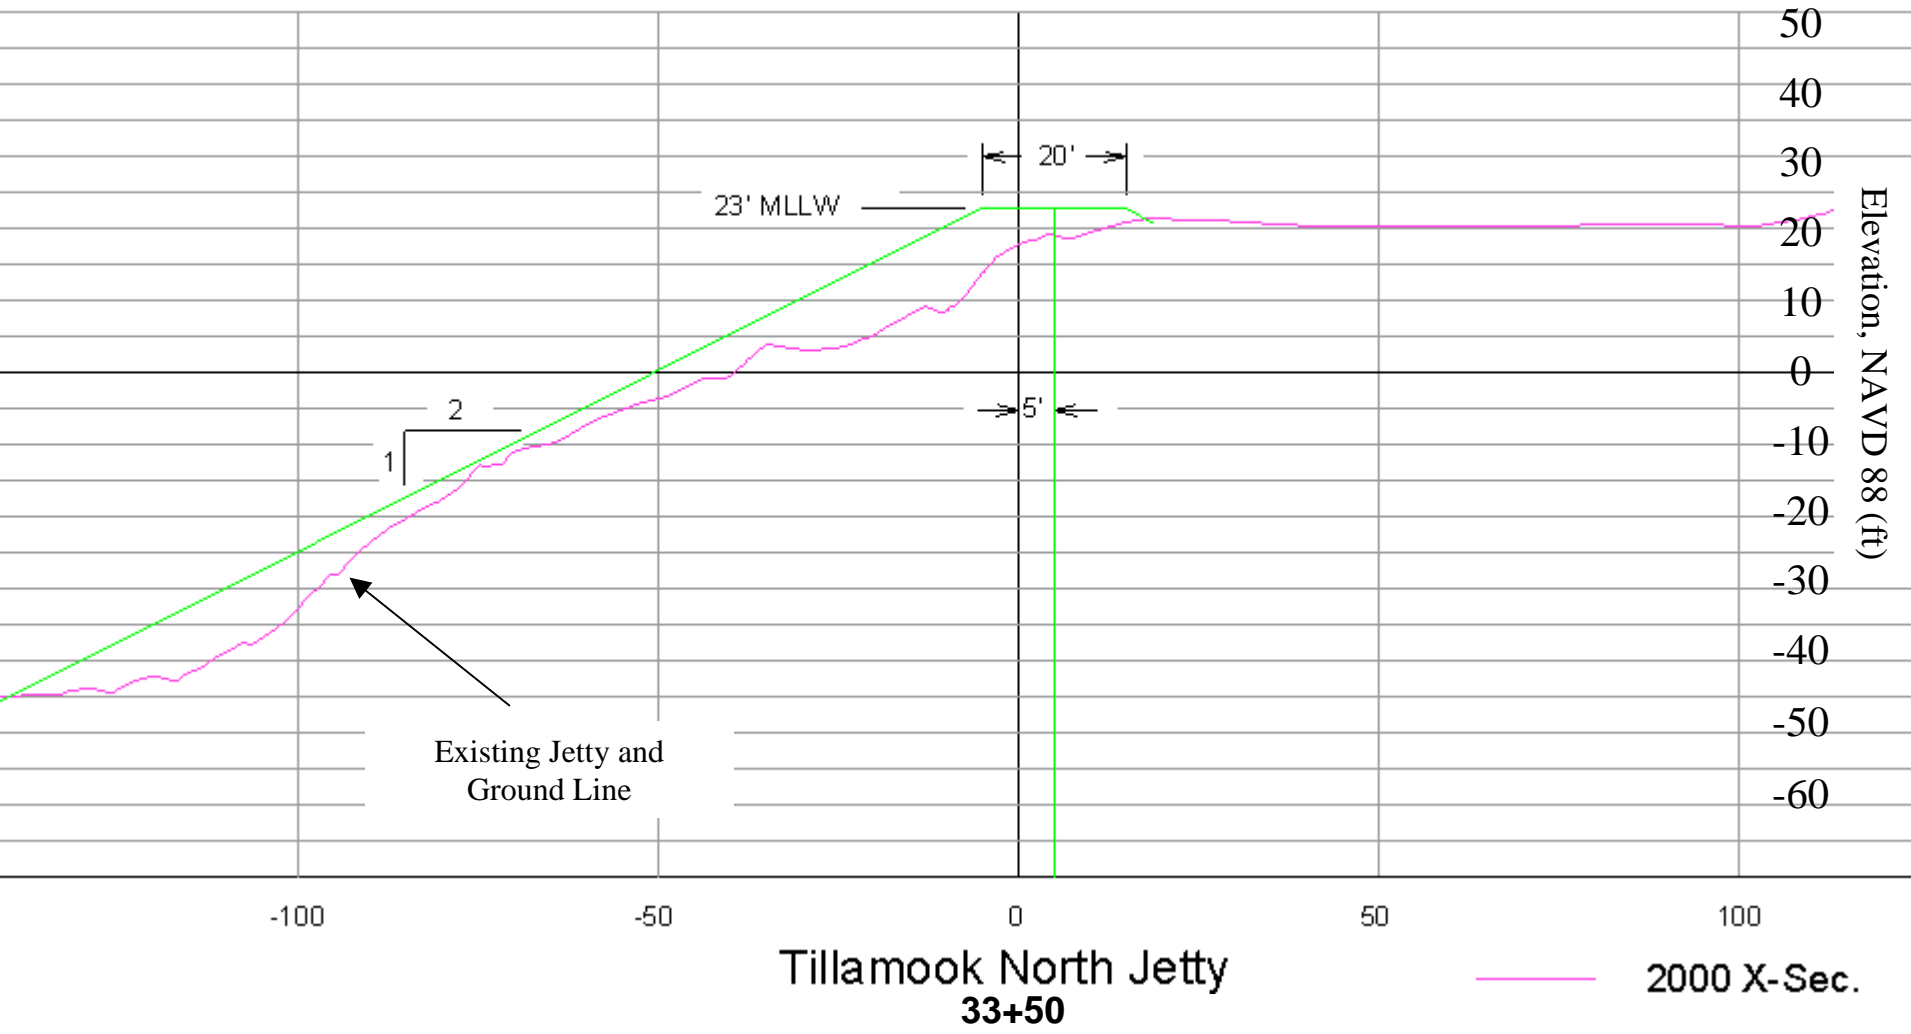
Typical Damage and Repair Design for North Jetty STA 30+00 to 37+00
